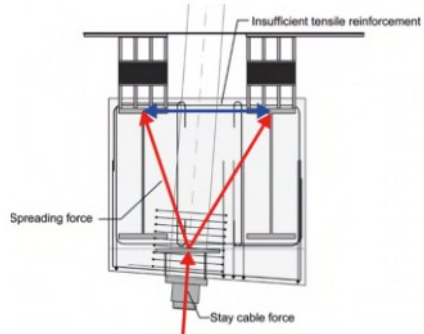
Stay cable anchoring force introducing tensile stresses at top face of the anchor beam due to spreading out compressive forces
